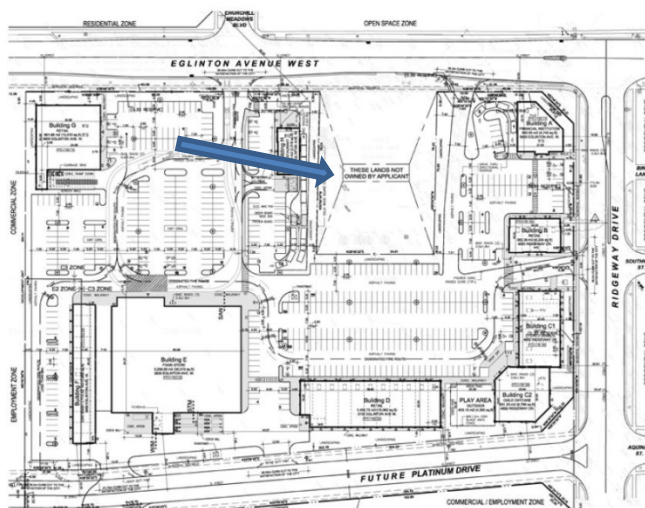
Proposed development plan, ca. 2010 (Webster Real Estate Ltd.)
